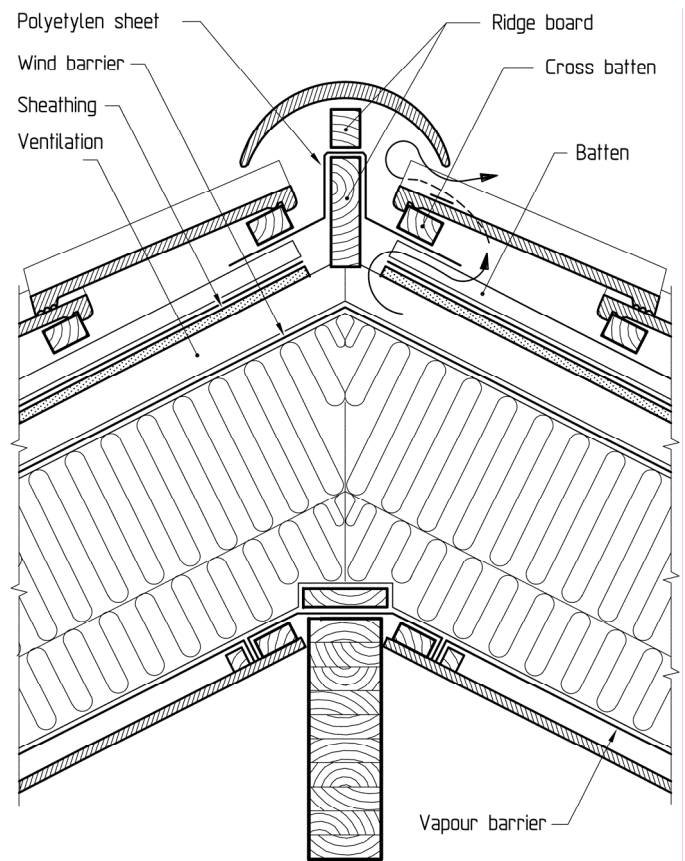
A modern pitched insulated roof construction with separate wind barrier and sheathing.
